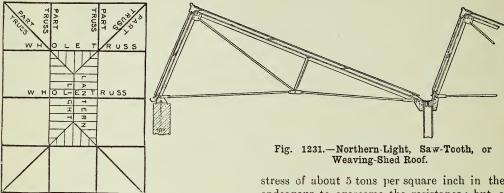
Hipped Ends of Lantern Light in Steel Roof Truss.
